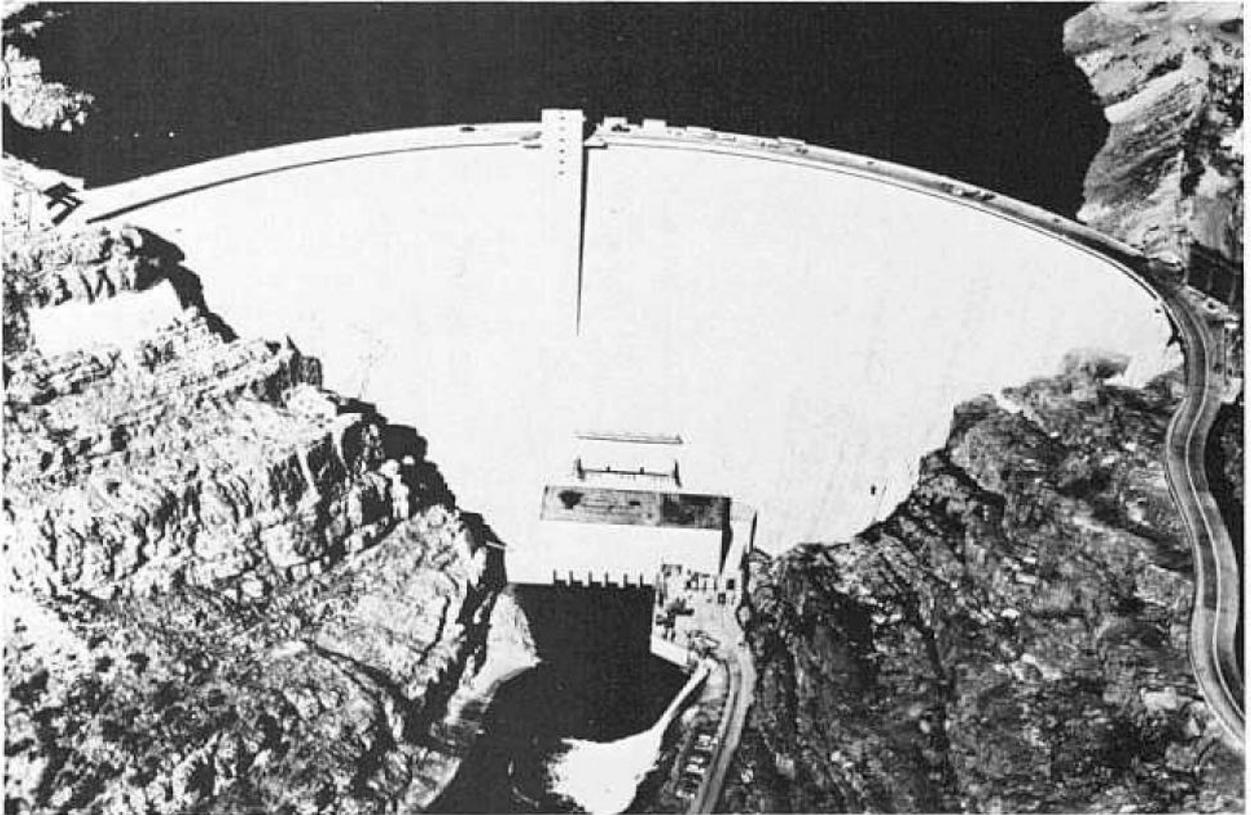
Aerial view of Flaming Gorge Dam and Powerplant.—P-591-421-5058
